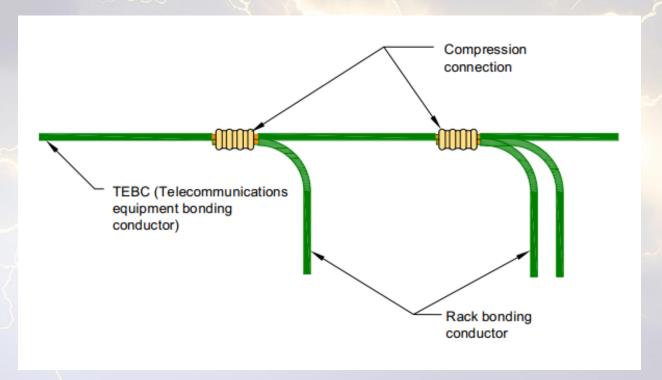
Typical Arrangement of Cable Tray Bonding and TEBC connections
